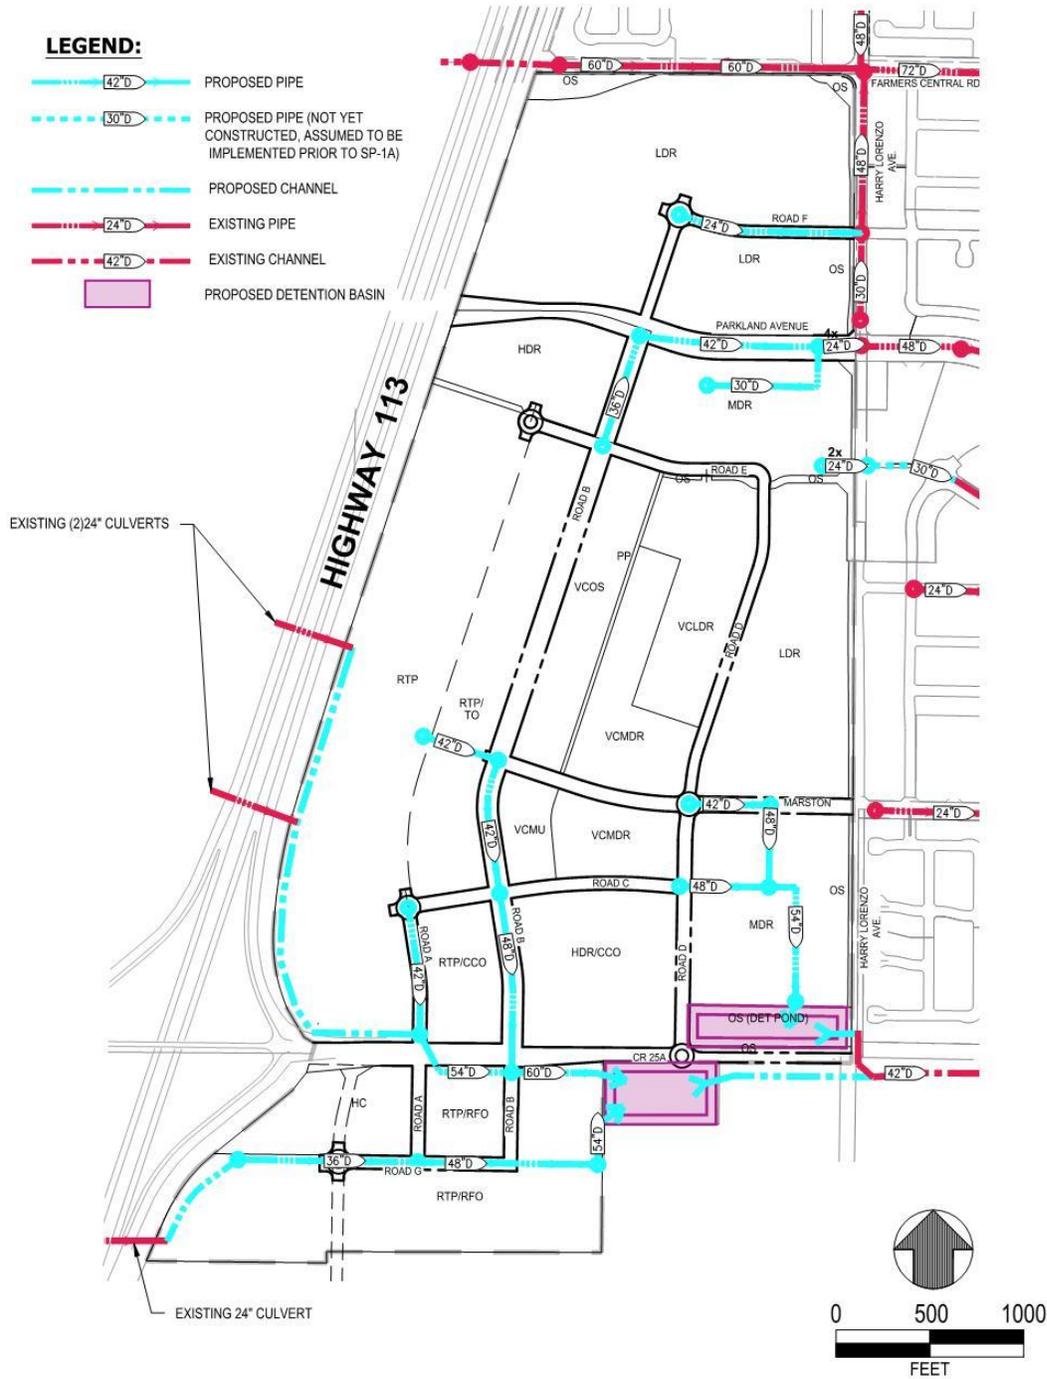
PROPOSED DRAINAGE AND STORMWATER SYSTEM
